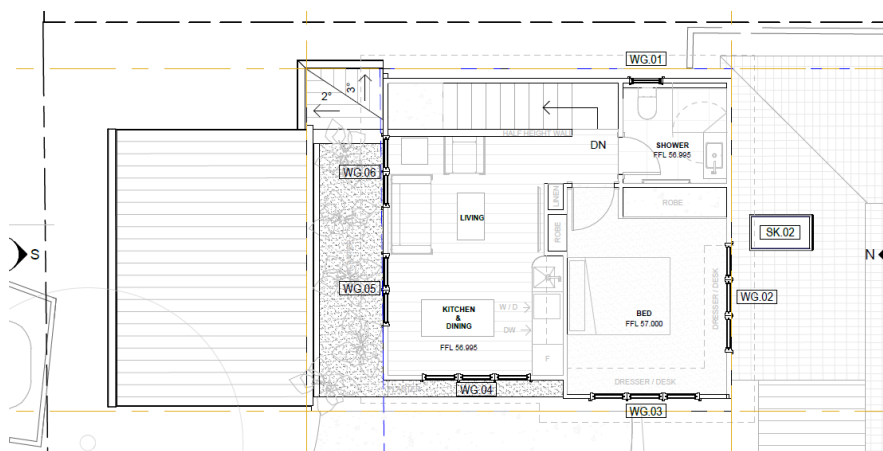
Proposed first floor – secondary dwelling (source: Studio Lykke)
